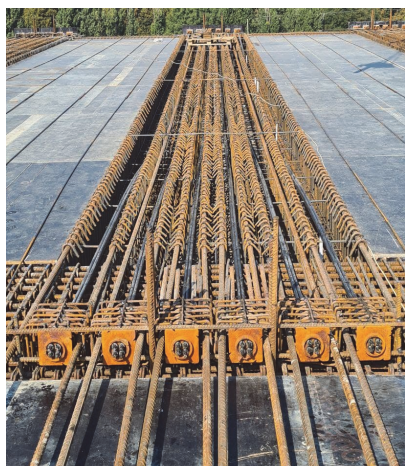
Post-tensioning monolithic reinforced concrete beam during construction (School construction in Kyiv)[1]
